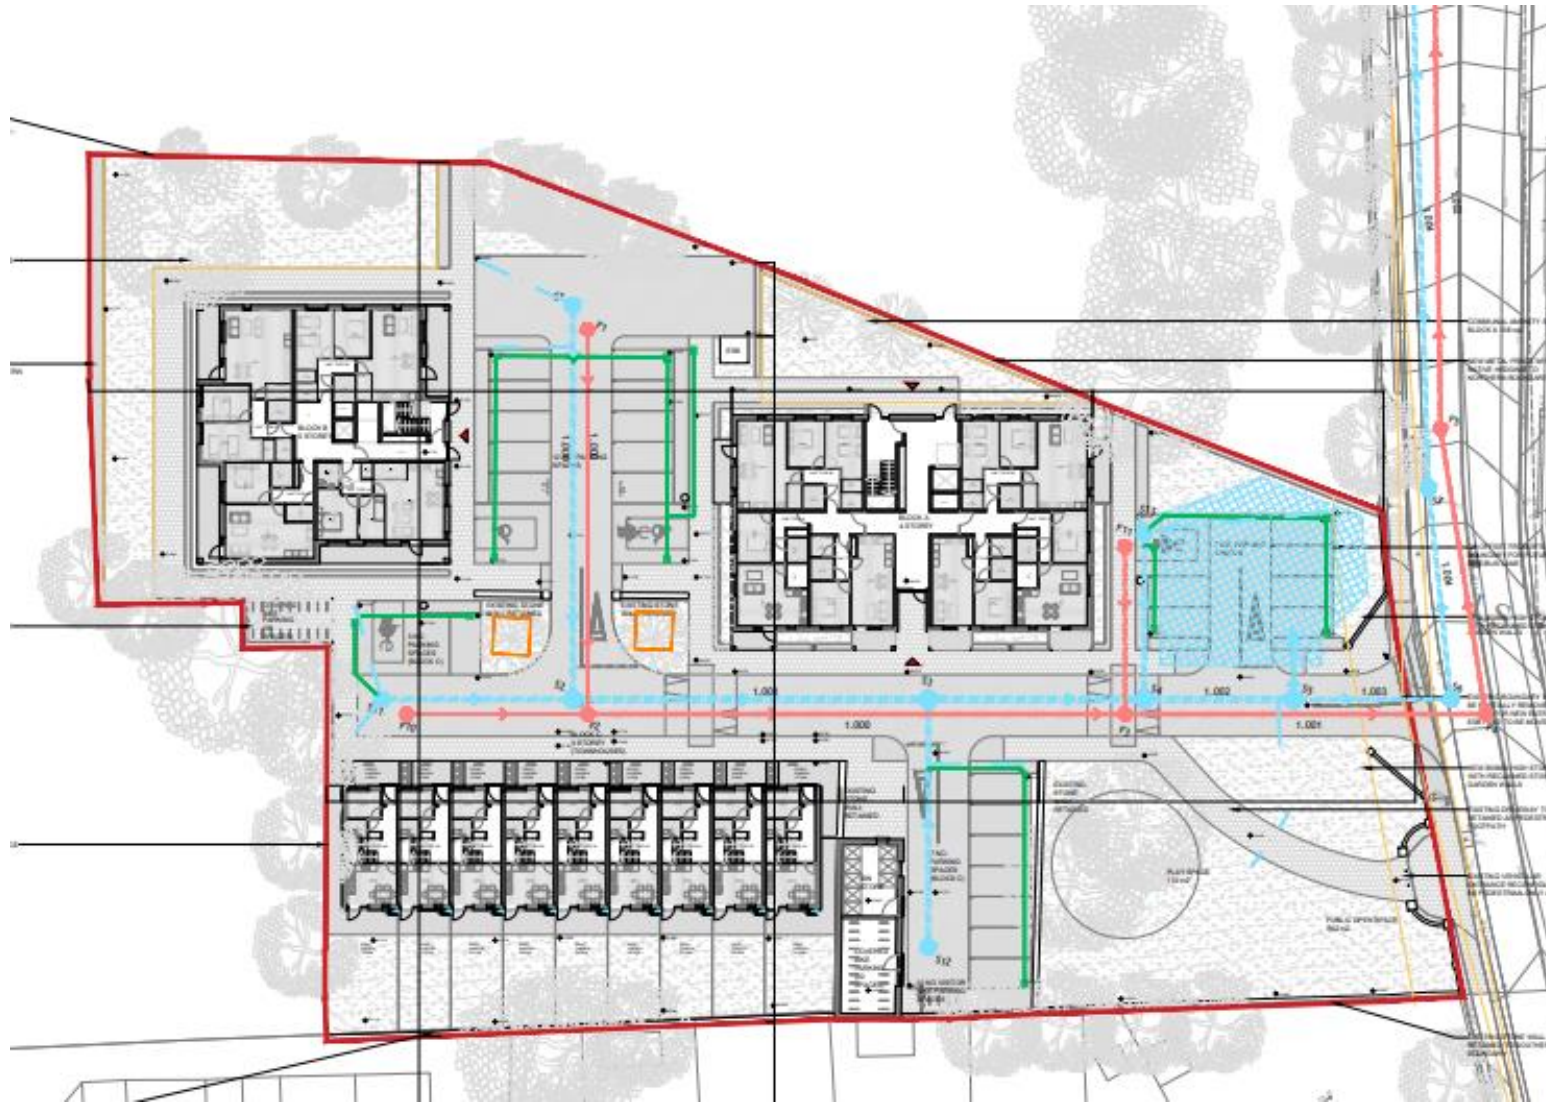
Extract from proposed site layout plan, Wicklow County Council
